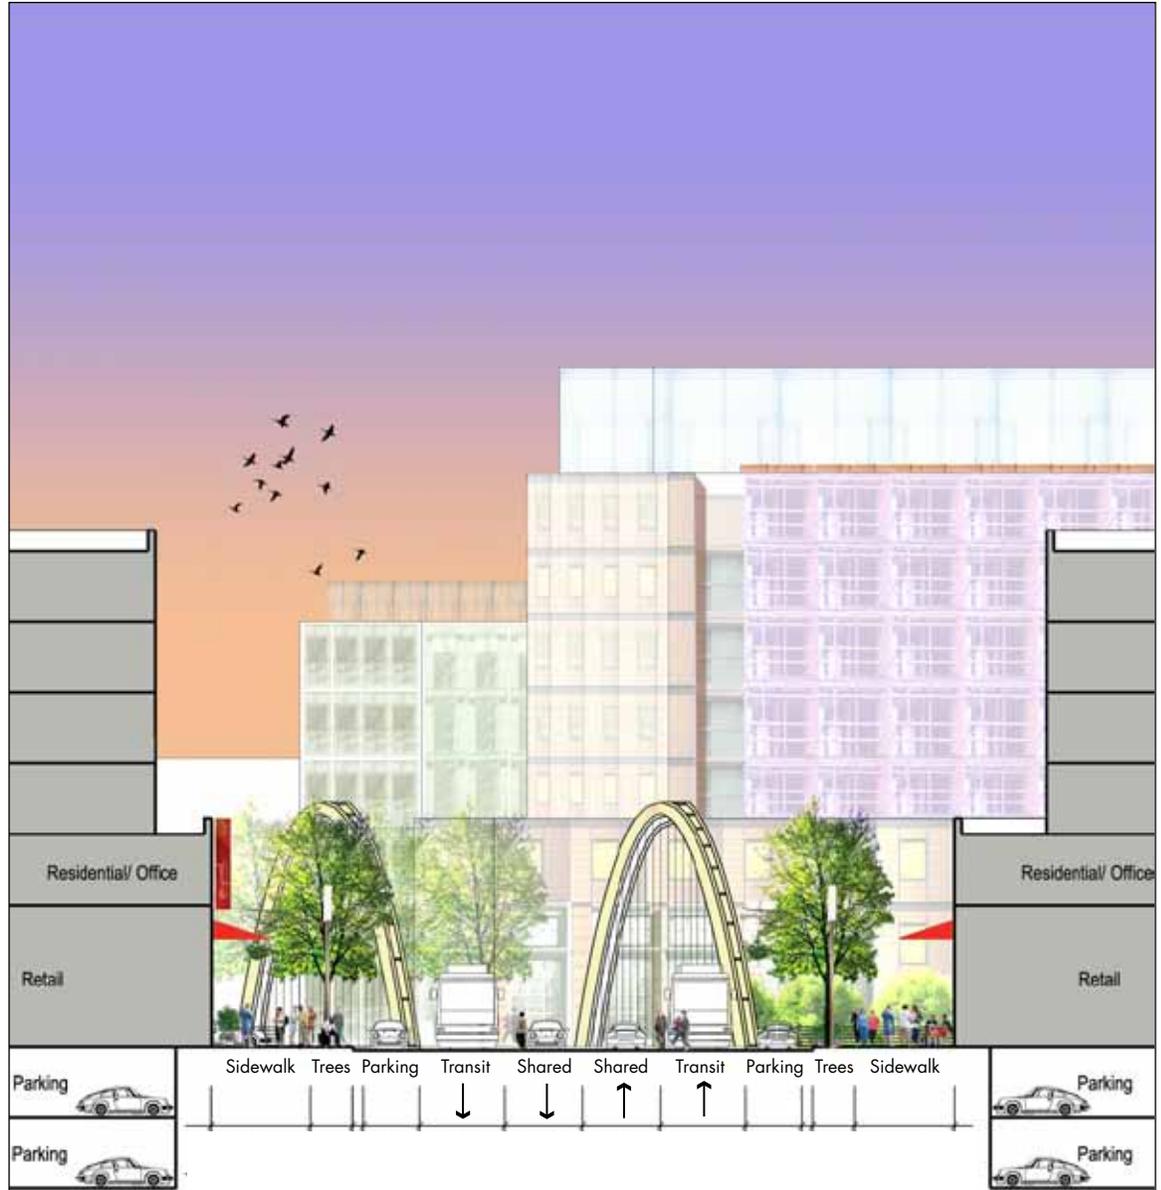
New High Street. The cross-section for New High Street north of Stevenson Avenue includes dedicated transit lanes and a broad sidewalk area.
